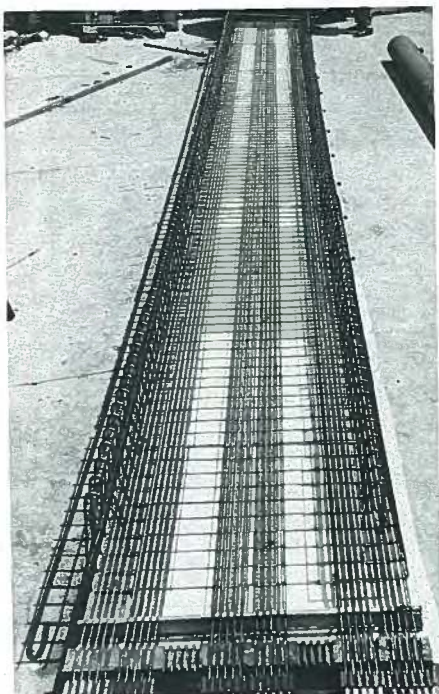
End view of Pottstown girder showing details of reinforcement.
